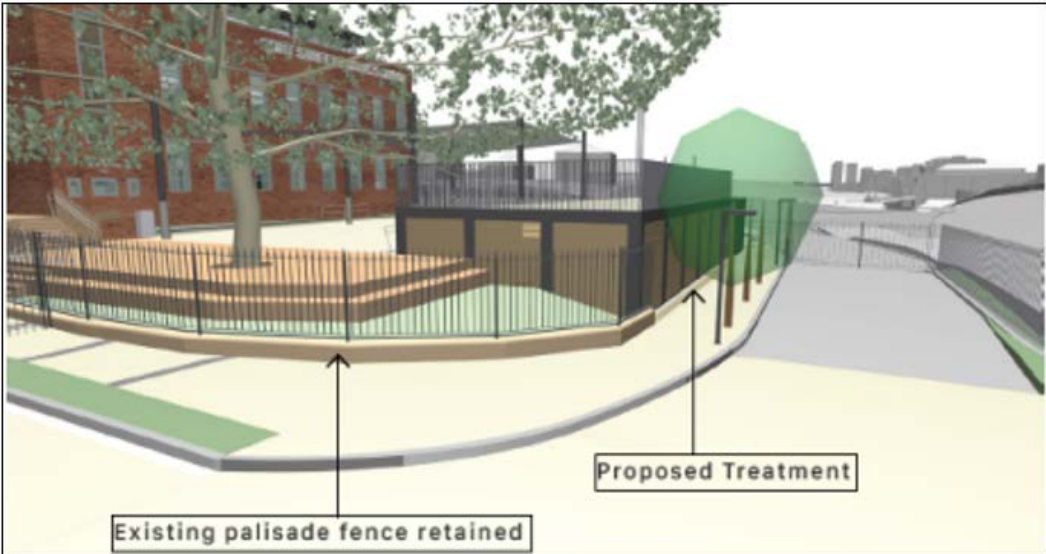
| Proposed treatment in place of palisade fence and sandstone kerb adjoining new drop-off / pick-up zone (Source: Modification report 2021)
